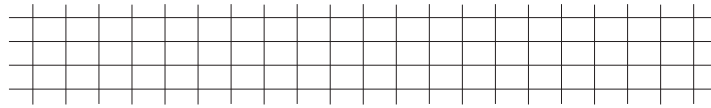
The arrangement of longitudinal and transversal beam in the beam grillage for level 1.
